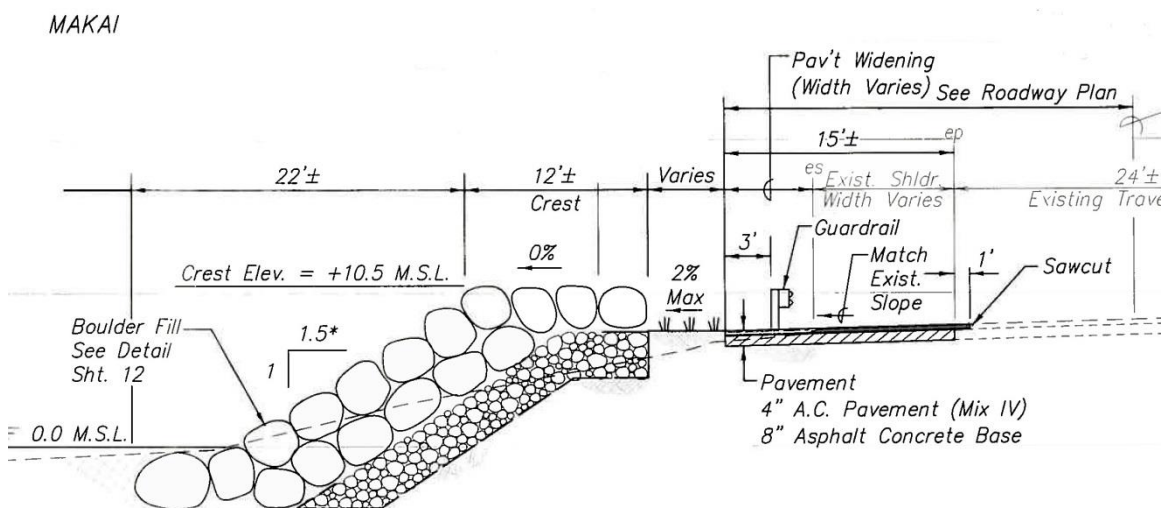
Typical cross-section of boulder fill proposed for Honoapi'ilani Highway.
